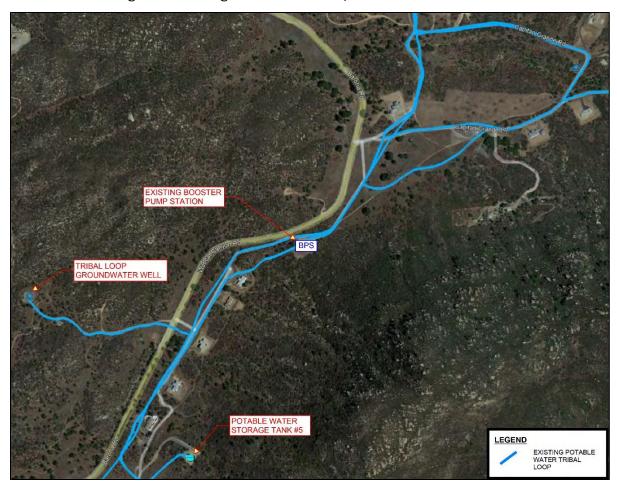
Existing Tribal Booster Pump Station North of Tank #5
